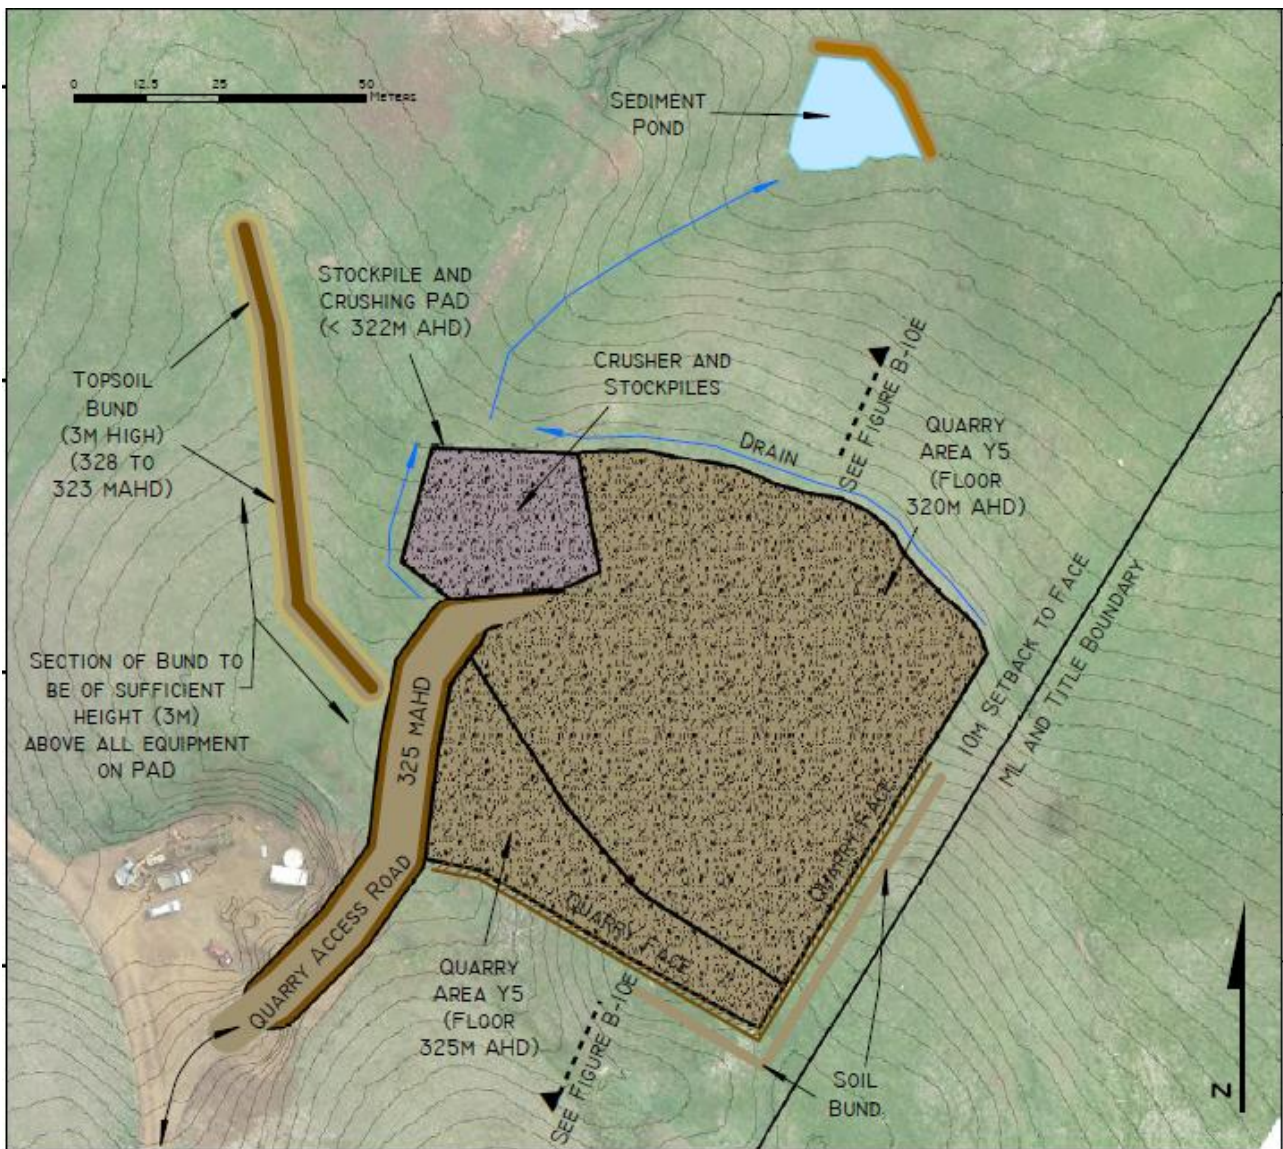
Site plan to Year 5 of mining plan (Figure B-9 of the EER Supplement)
